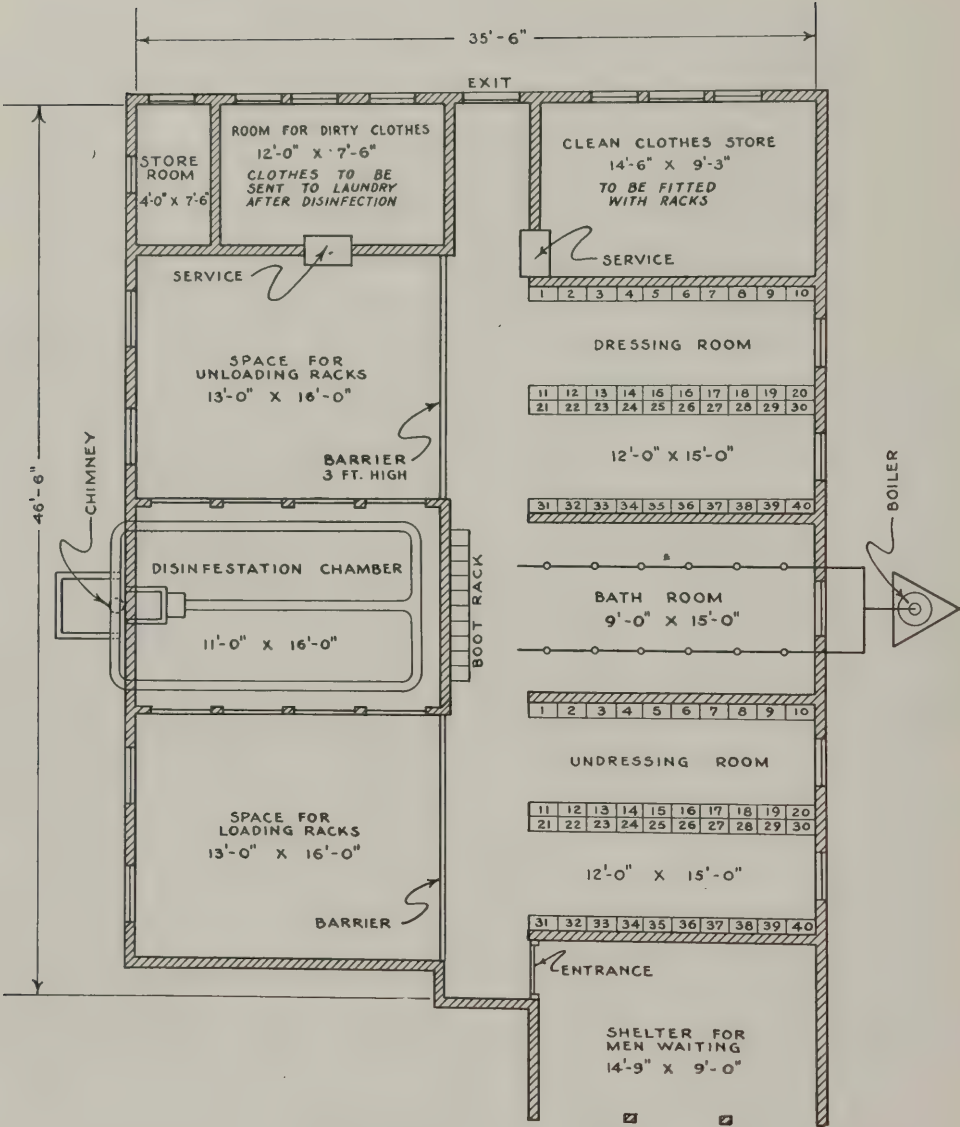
Jacobs' suggested plan for bathing and dry-air disinfection
